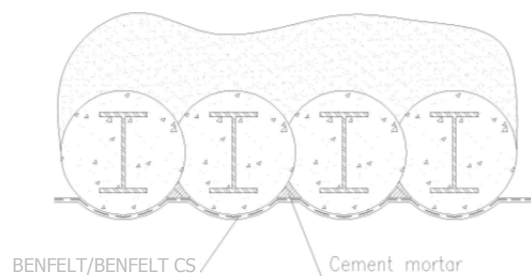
Instruction of installation on fixed cover development made of piles - top view.
